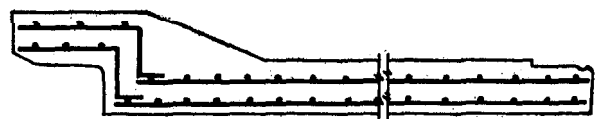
TYPICAL ARRANGEMENTS OF REINFORCEMENT IN SOCKET FOR SINGLE CAGE
